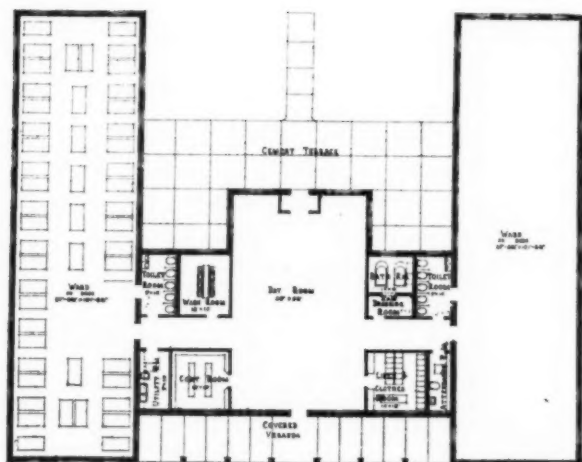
Floor plan of model cottage for custodial patients to be erected at Dixon State colony and Alton State Hospital. The day room has light and air from two sides, with covered porch on one side and an open cement terrace on the other. Single story.
